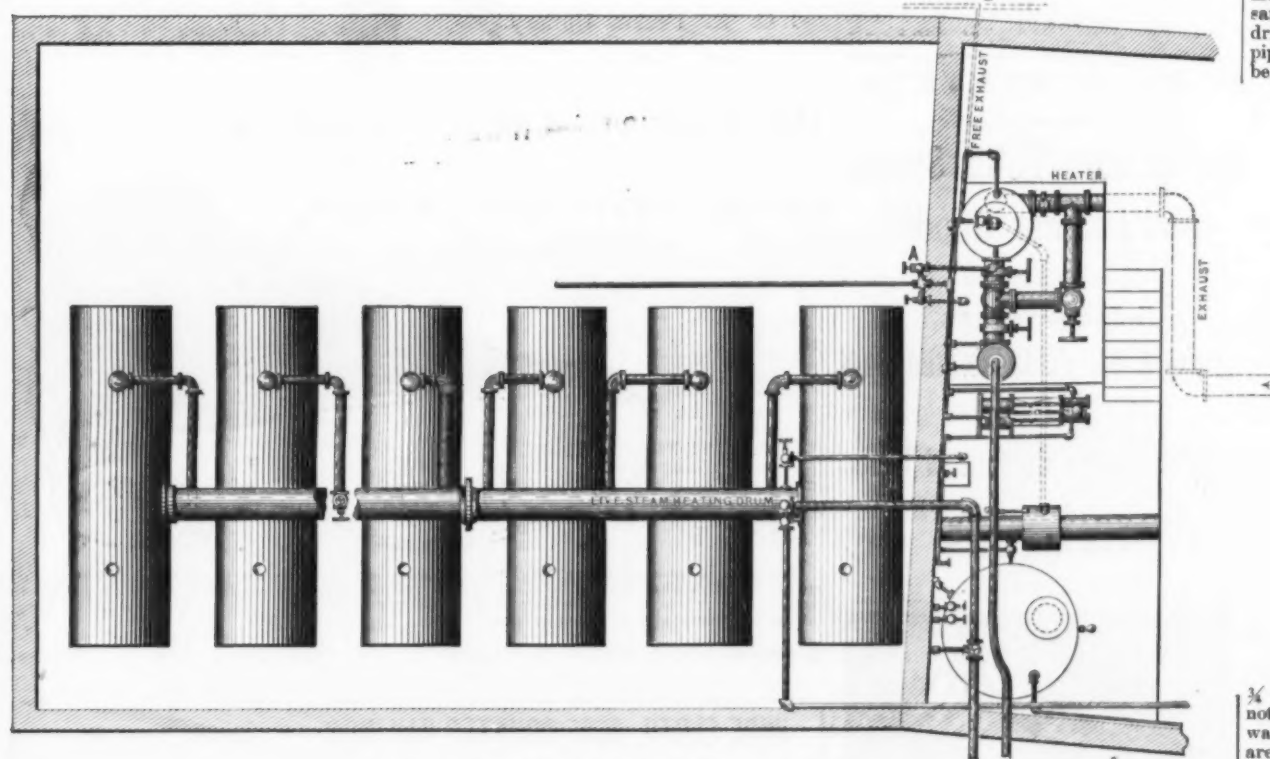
Plan of Boilers and Piping in Engine-Room.
